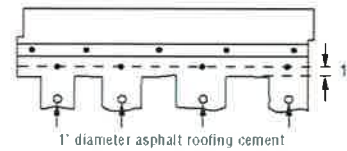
Fastening Presidential and Presidential TL Shake shingles on steep slopes.
